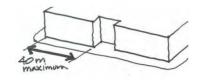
Limit the visual mass of building façades to lengths of 40 m or less.
